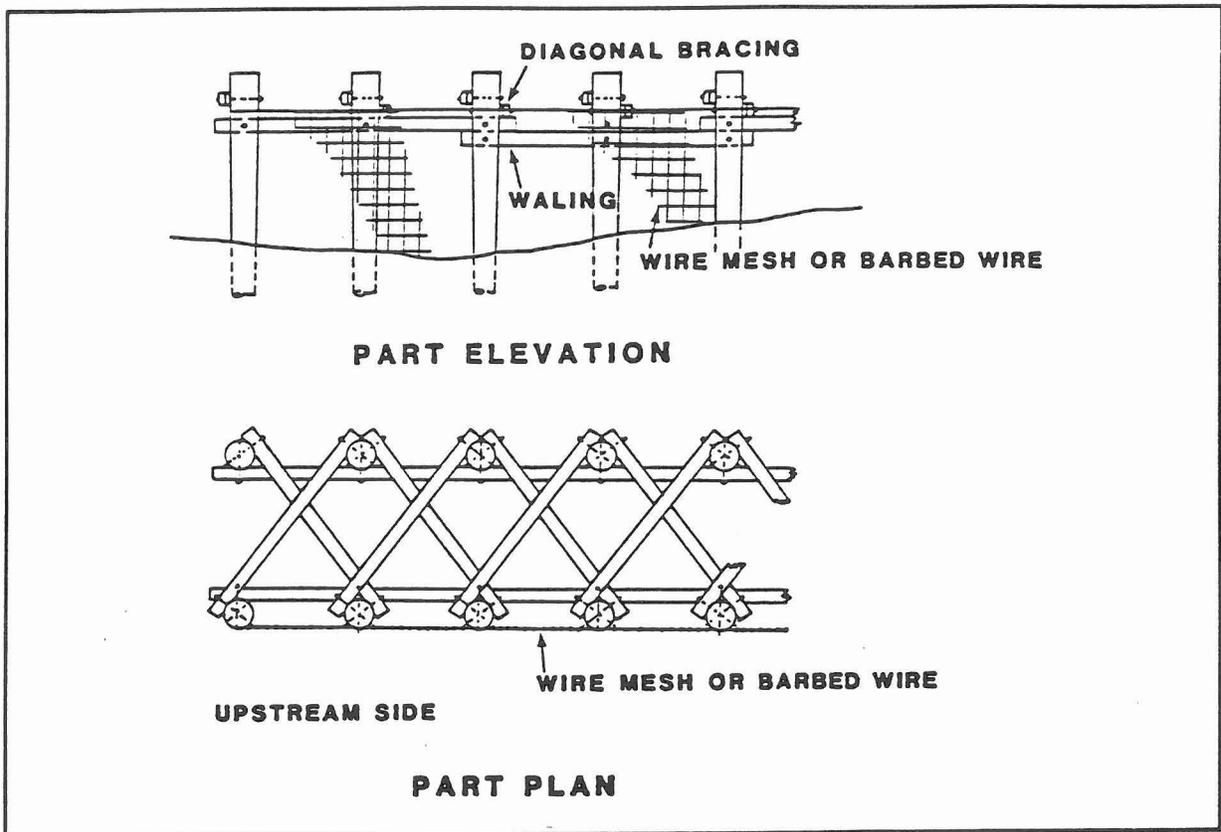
Timber pile bent retarder structure (Modified from California Department of Public Works, 1970; After [37]).
